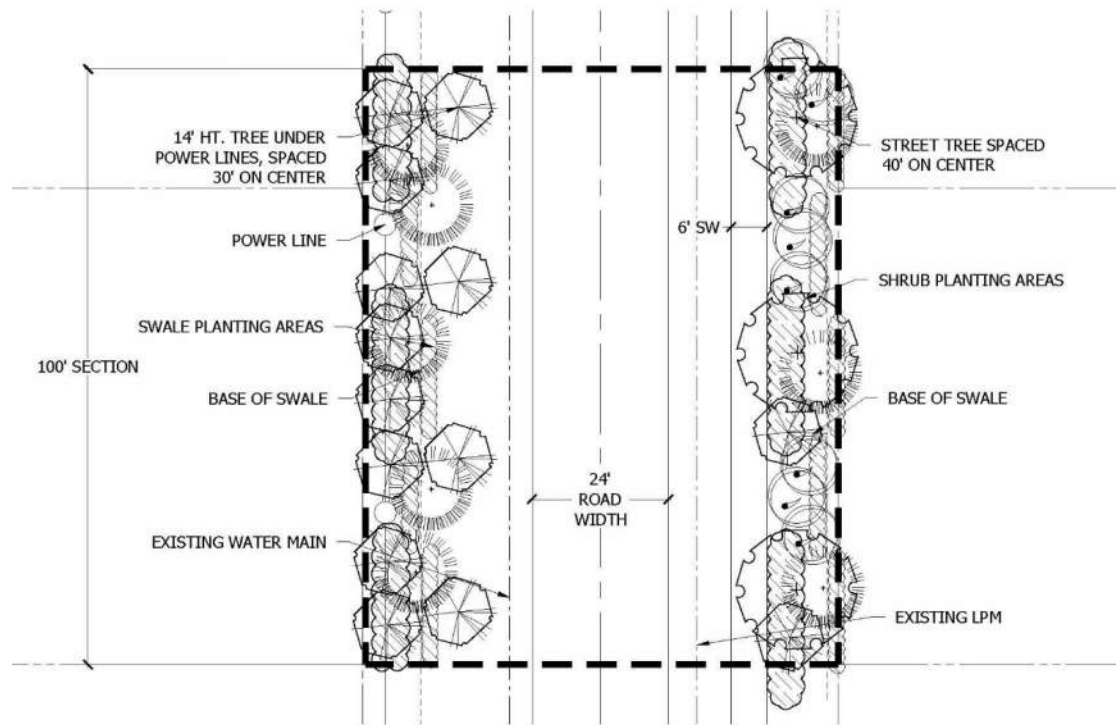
Typical 100-foot Plan View Section of Enhanced 80-foot Right-Of-Way
